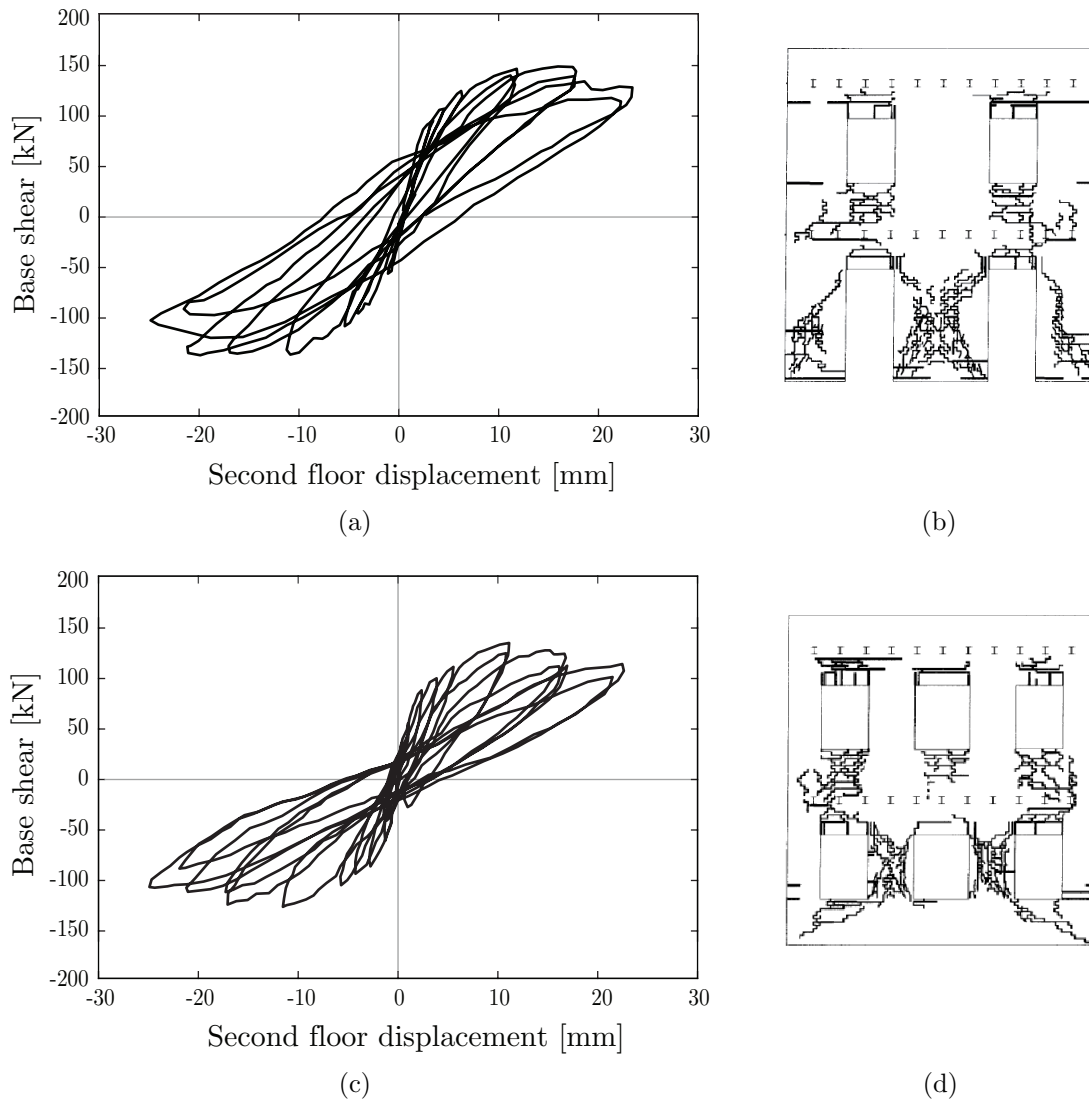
Base shear-second floor displacement curves for (a) wall D and (c) wall B; experimental failure paths for (b) wall D and (d) wall B.
